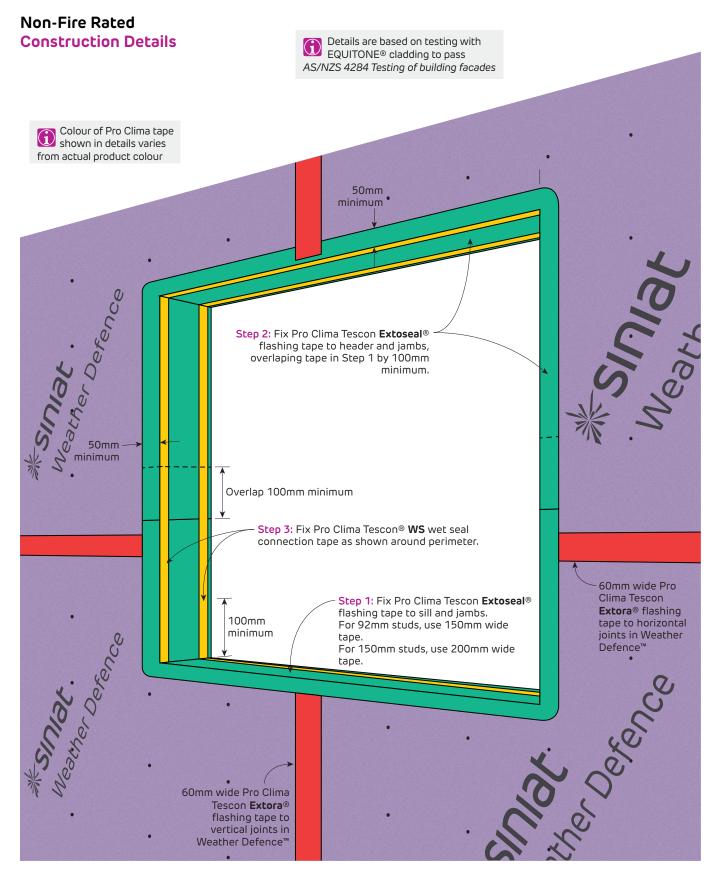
Alternative Flashing Tape Around OpeningsPerspective
